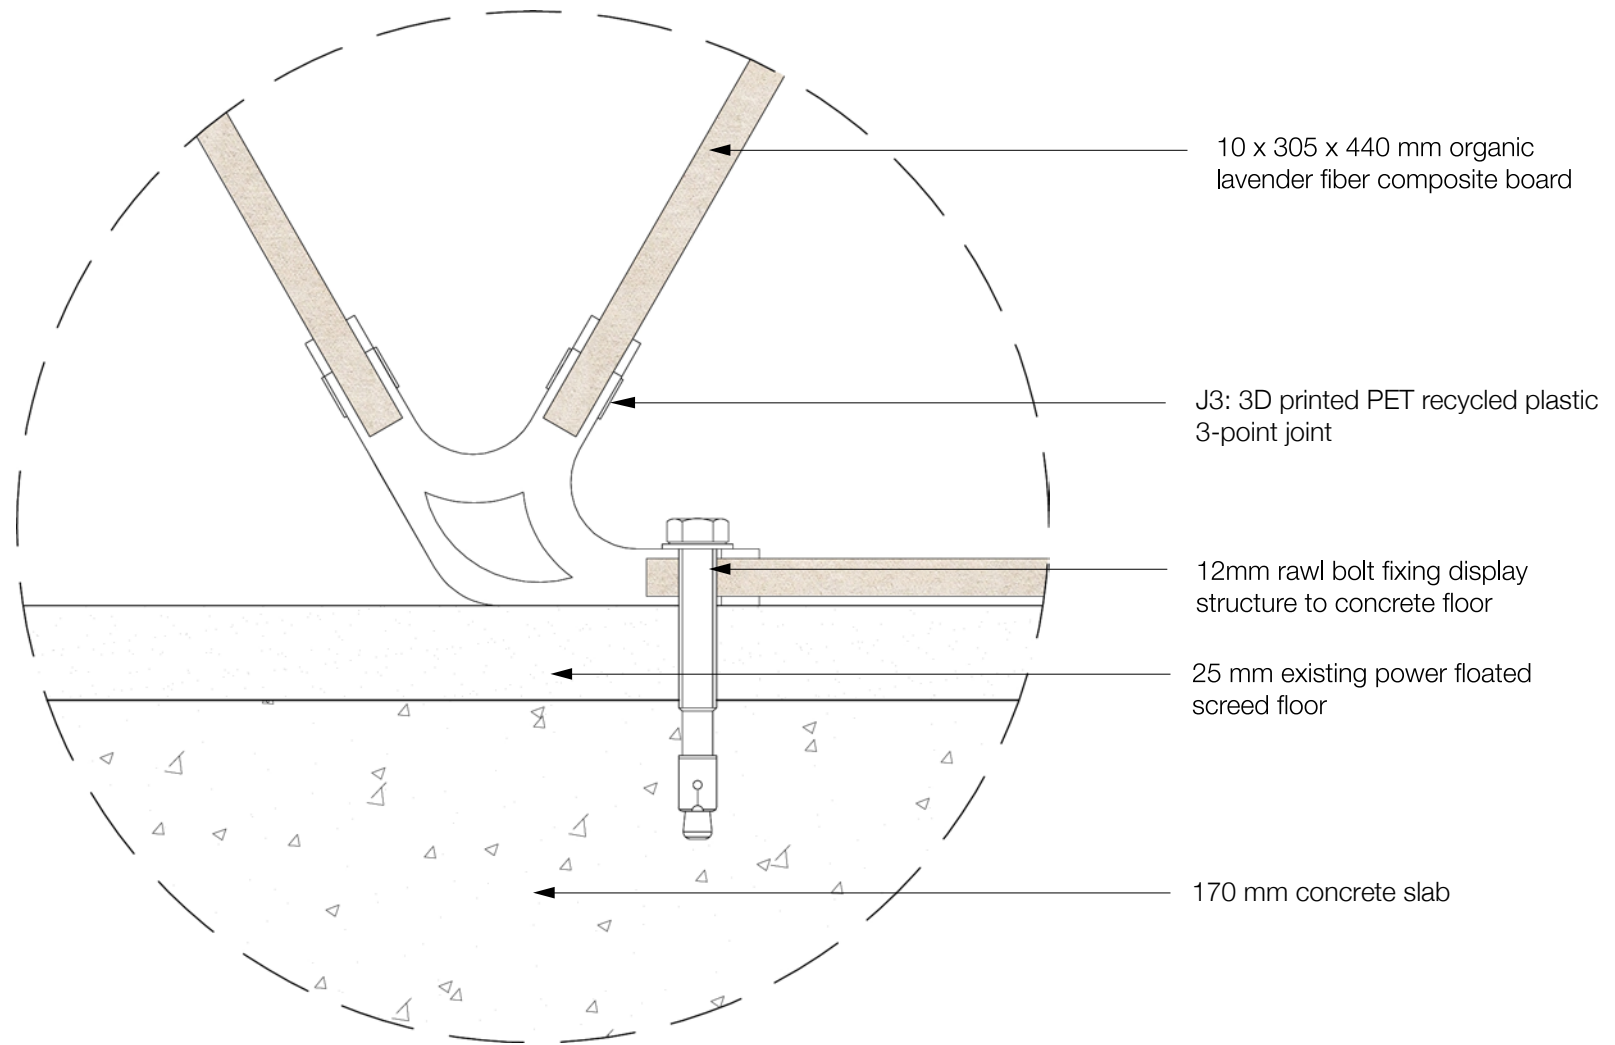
Detail 3: Dry wall connection (Author, 2016).
